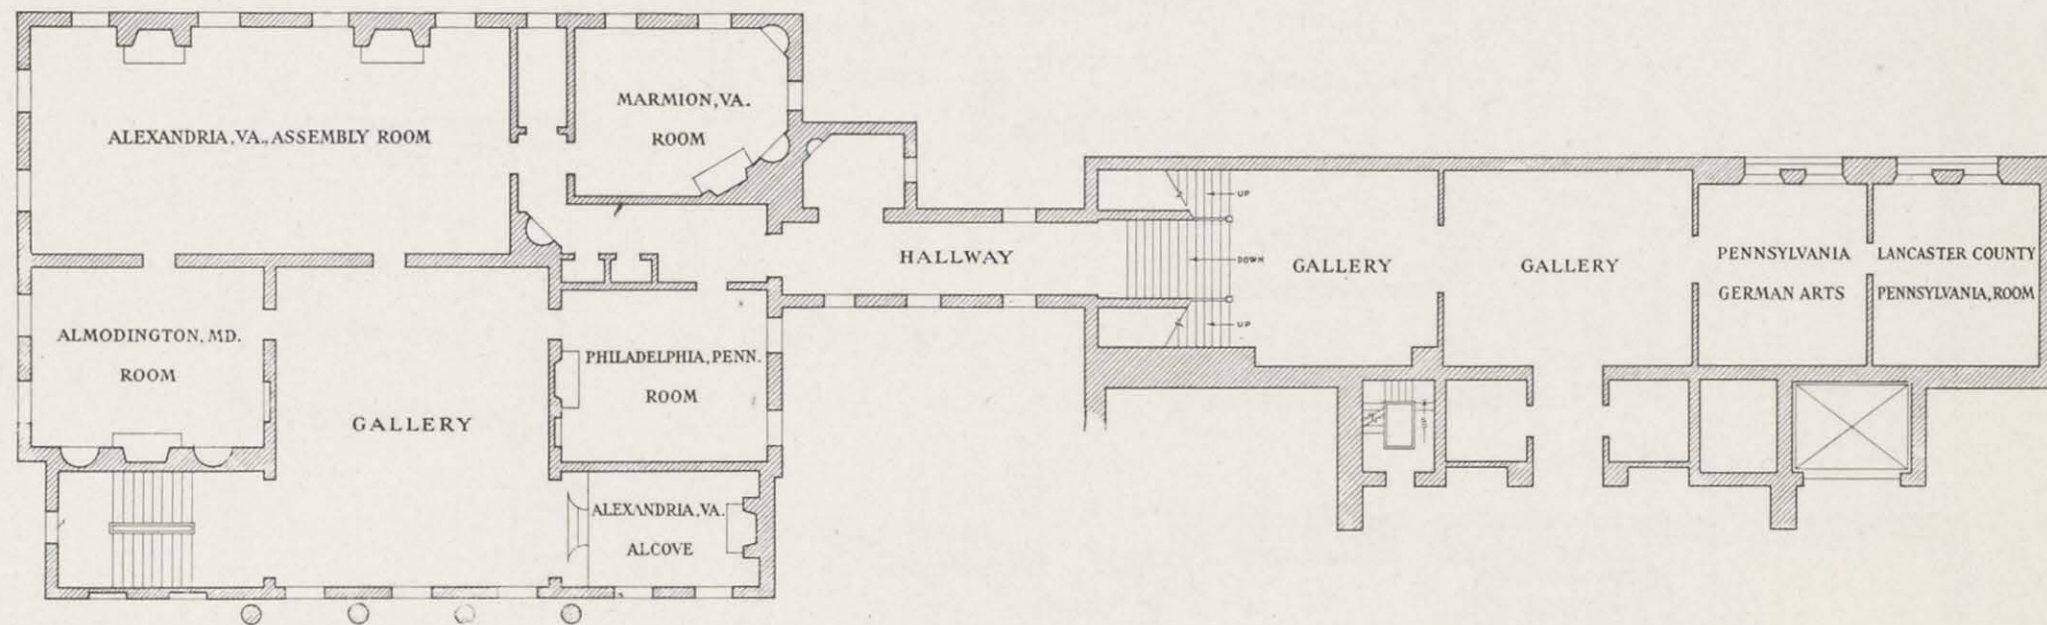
PLAN OF THE ROOMS OF THE SECOND FLOOR
